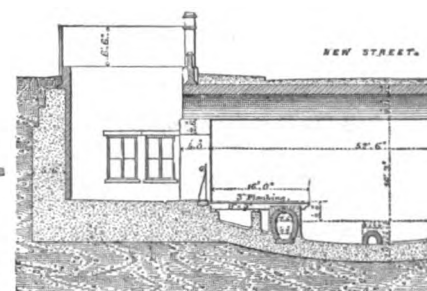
shows some of the difficulties encountered at the Cannon Street station, where at this section there was but one foot of depth available between the finished work of the covered way and the road, and to gain the necessary head-room the girders at the centre were given a depth of but two feet. It will be seen that they are built as cantilevers, supported on posts, and held down by the side walls into which they are anchored, the anchors being shown by dotted lines. A middle and a high-level sewer (the latter not shown) had also to be provided for, and several gas and water mains diverted. Another portion of the station was under the court of the station of the South-eastern Railway (Fig. 21), where the cabs and other vehicles stood. The booking-offices were underneath this and
